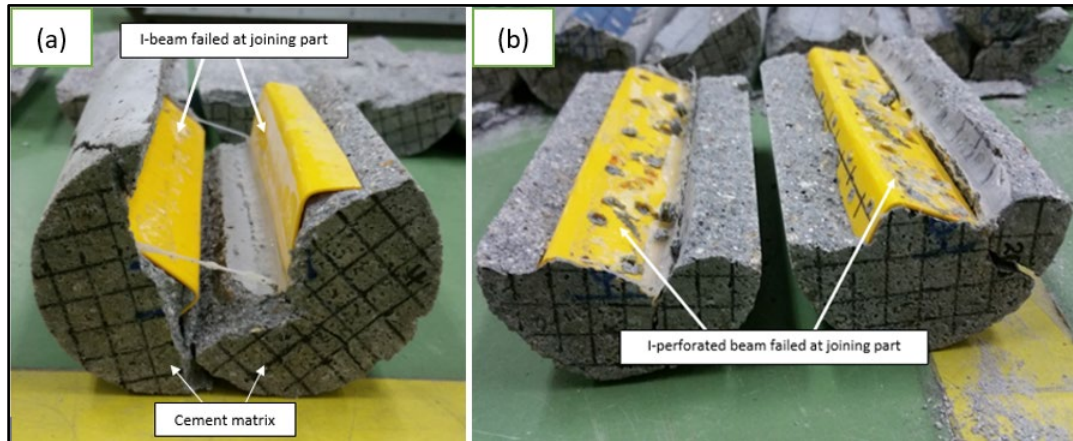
Failure mode of the concrete cylinder containing (a) I-beam and; (b) I-perforated reinforcement
